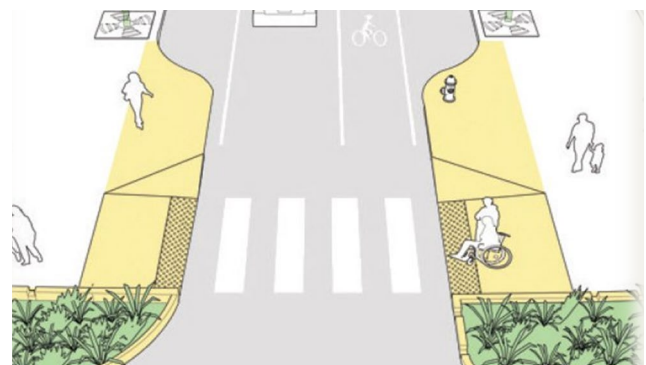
Shorter pedestrian crossings to encourage car to reduce speed (Source: <https://nacto.org/publication/urban-street-design-guide/street-design-elements/curb-extensions/gateway/>)
